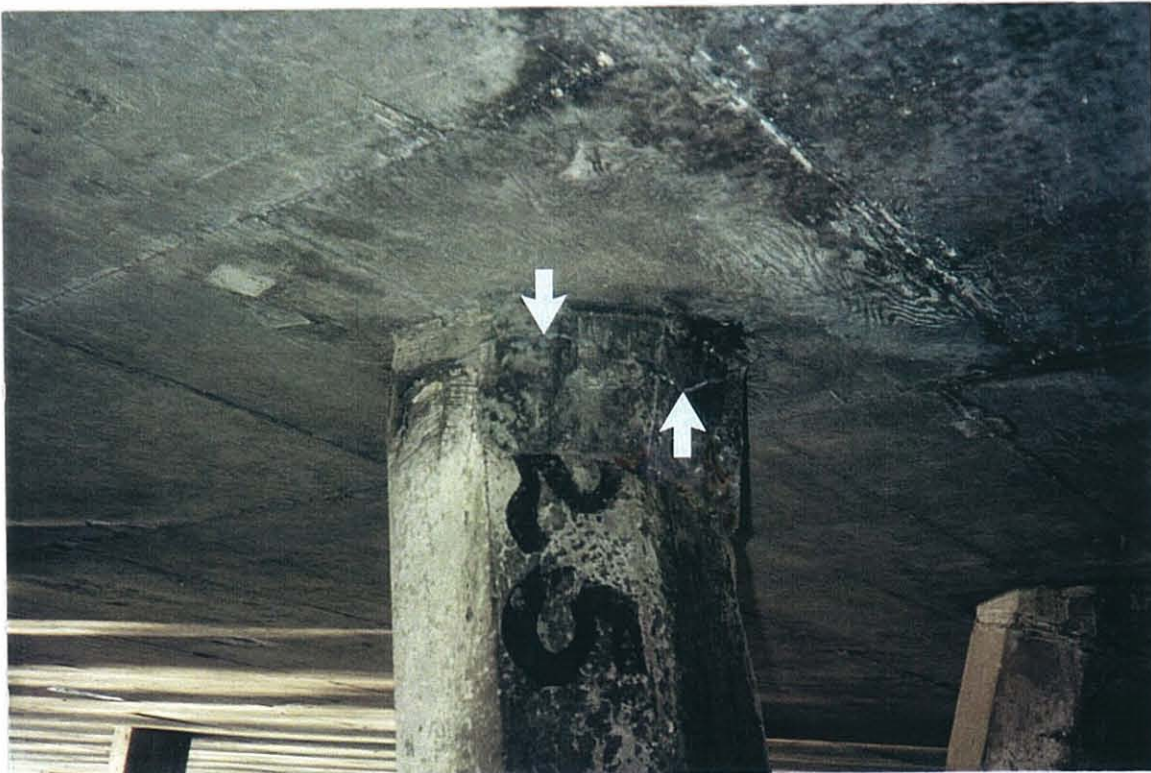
Overstressing crack at top of batter pile, immediately below connection to deck.
